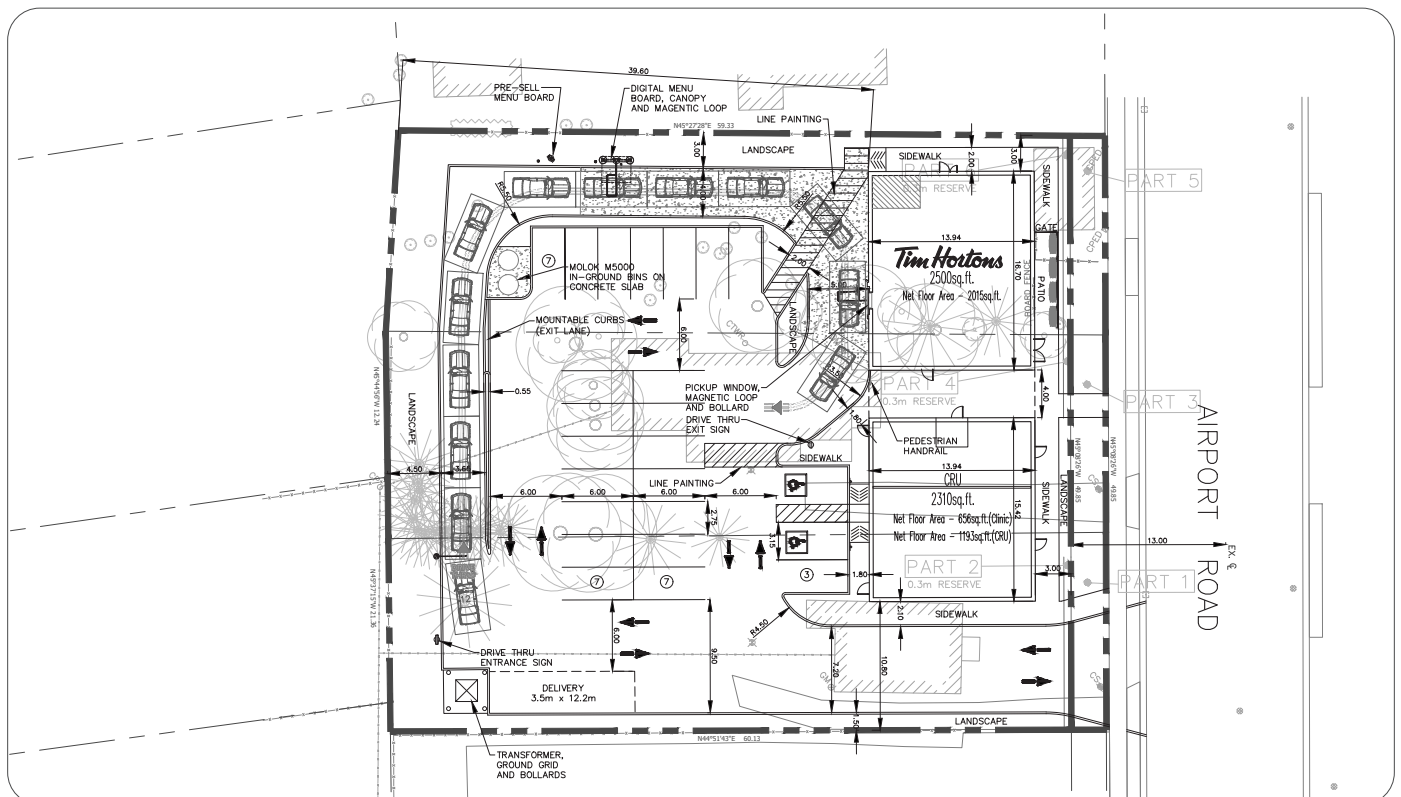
Revised Site Design. Courtesy of K. Paul Architect Inc.
